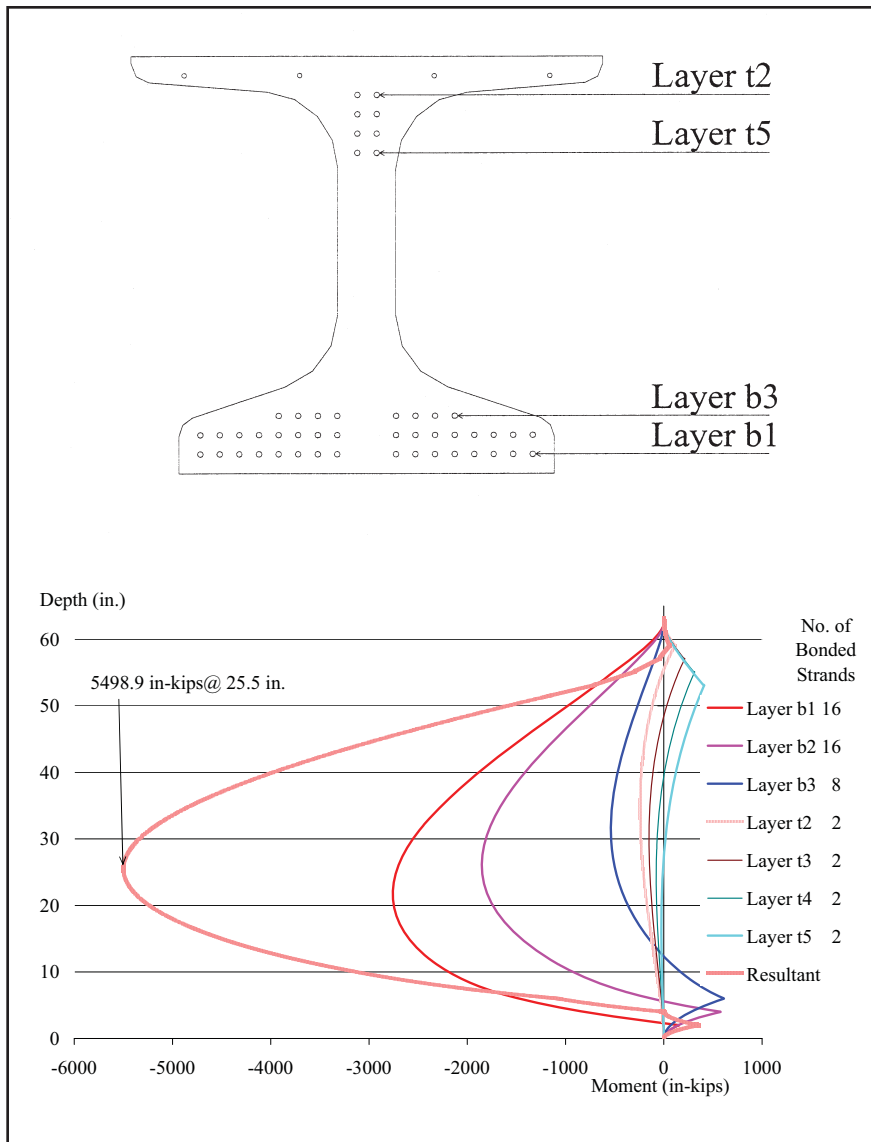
Moment diagram at end zone of NU1600 I-girder.
